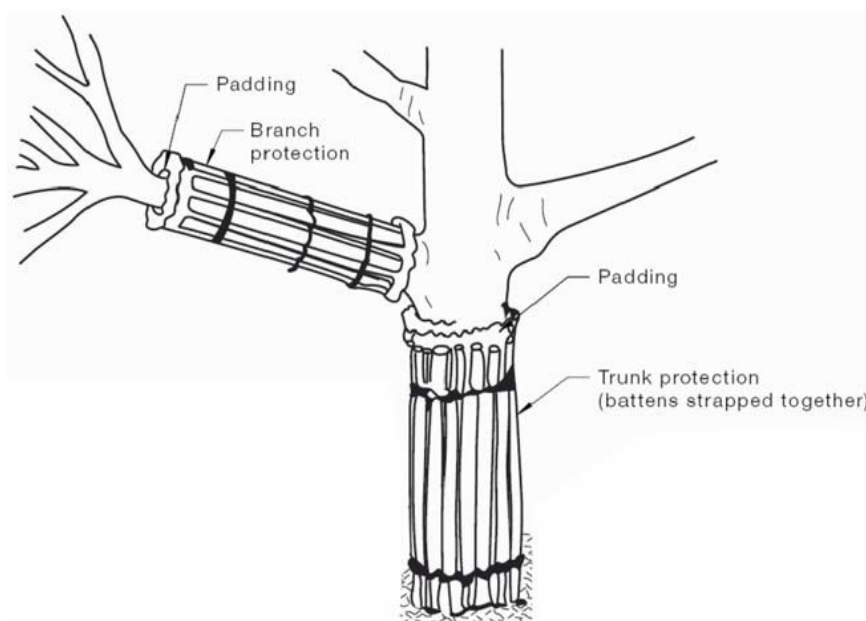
Detail of trunk and branch protection. (Standards Australia, 2009)
